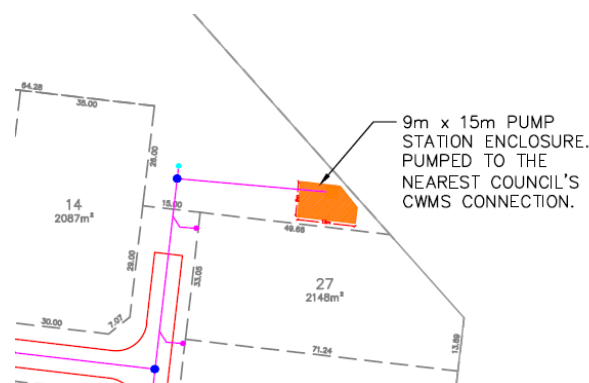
Proposed wastewater system location in reserve (Neilly Group)
